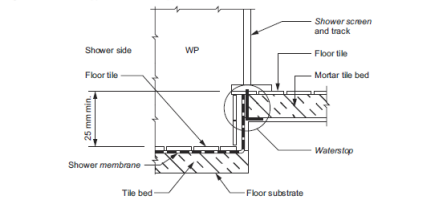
Typical unenclosed stepped down shower construction (membrane below tile bed)
